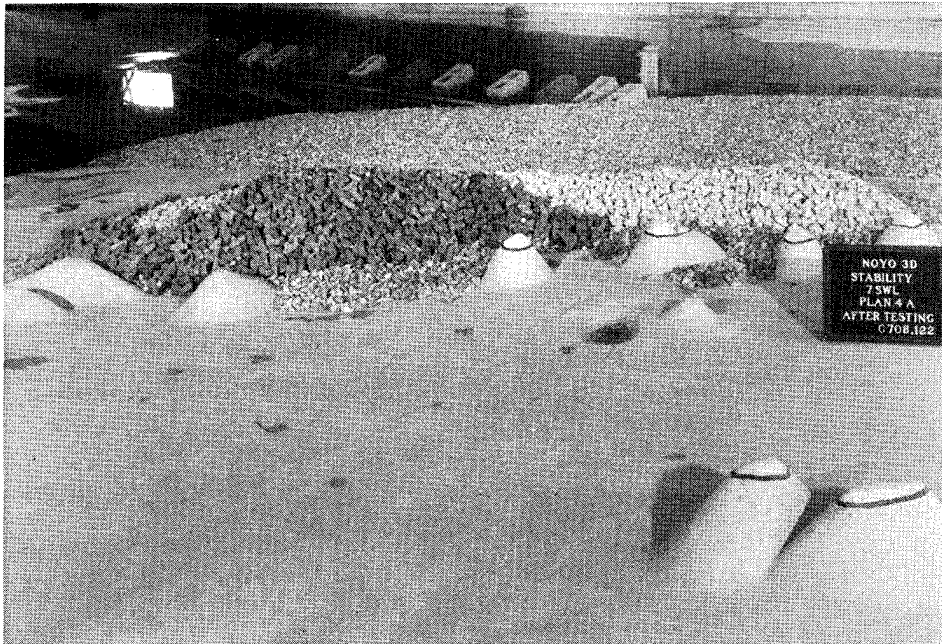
Sea-side view of Plan 4 after Storm IA waves
